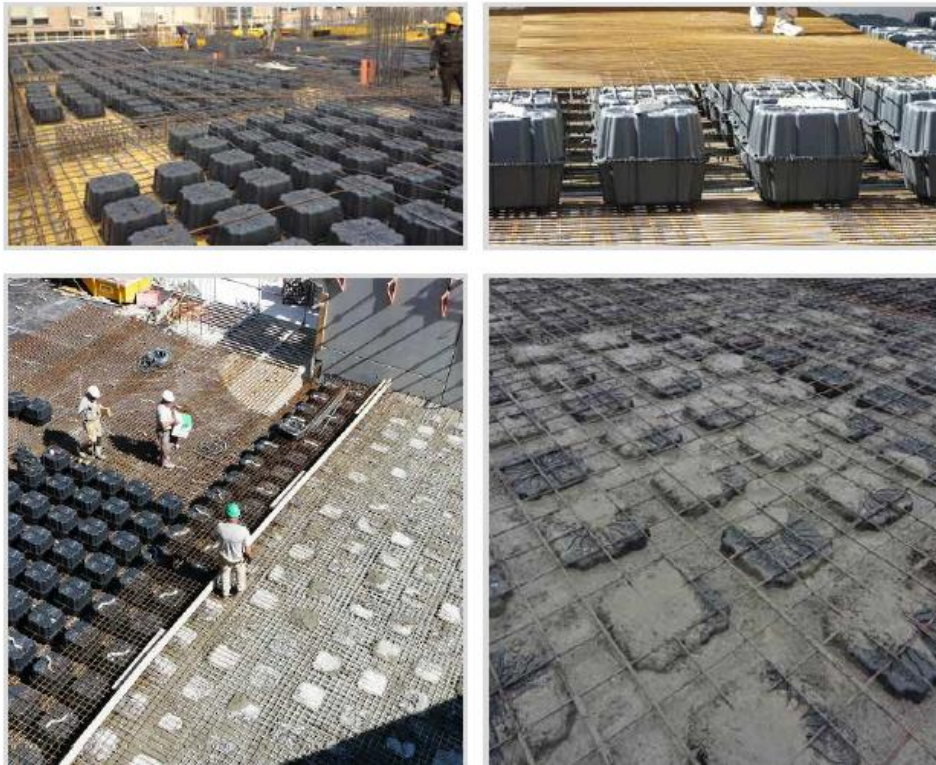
Formwork and layout of NEW NAUTILUS spherical voids,[6]
